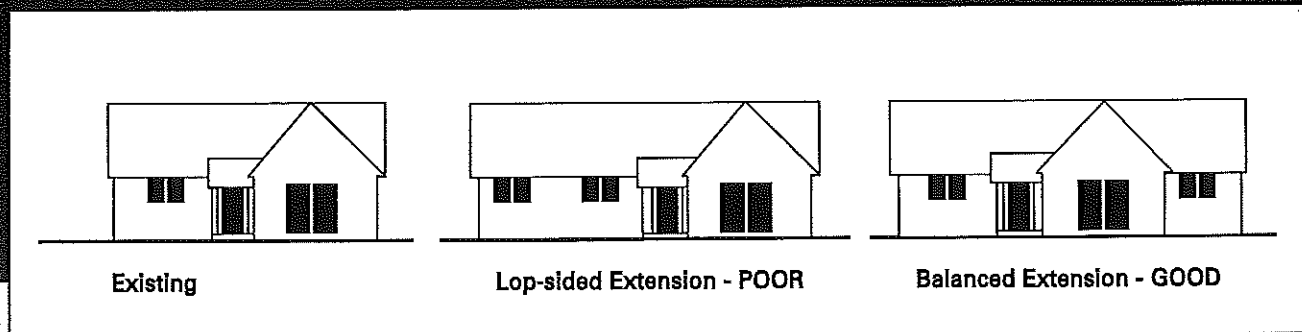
MAIN FRONTAGE GABLE - creating a balanced elevation
